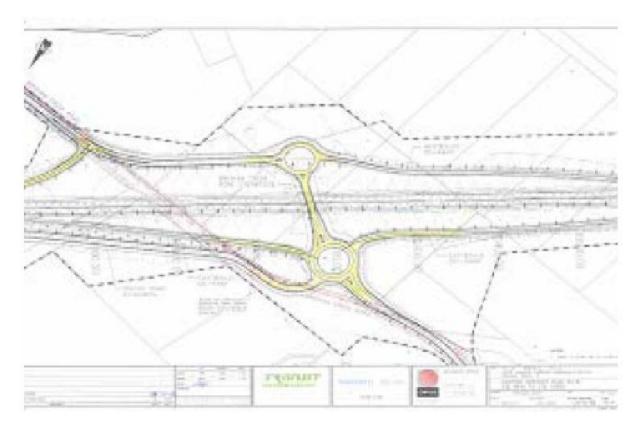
Kedgley Drive Replacement Planting Concept Plan
